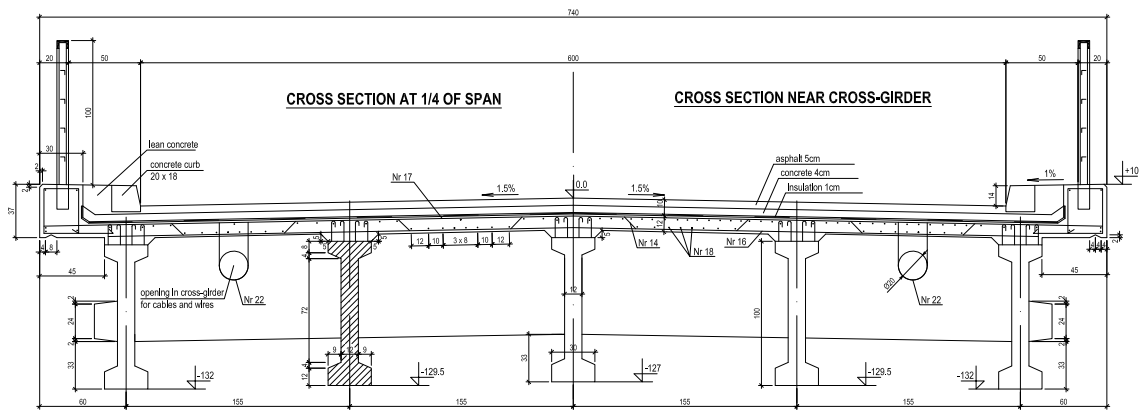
Bridge cross section before retrofitting (dimensions in [cm])
